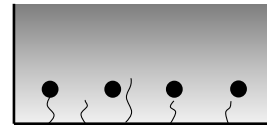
Conceptual figure for micro cracks around a concrete cover.
